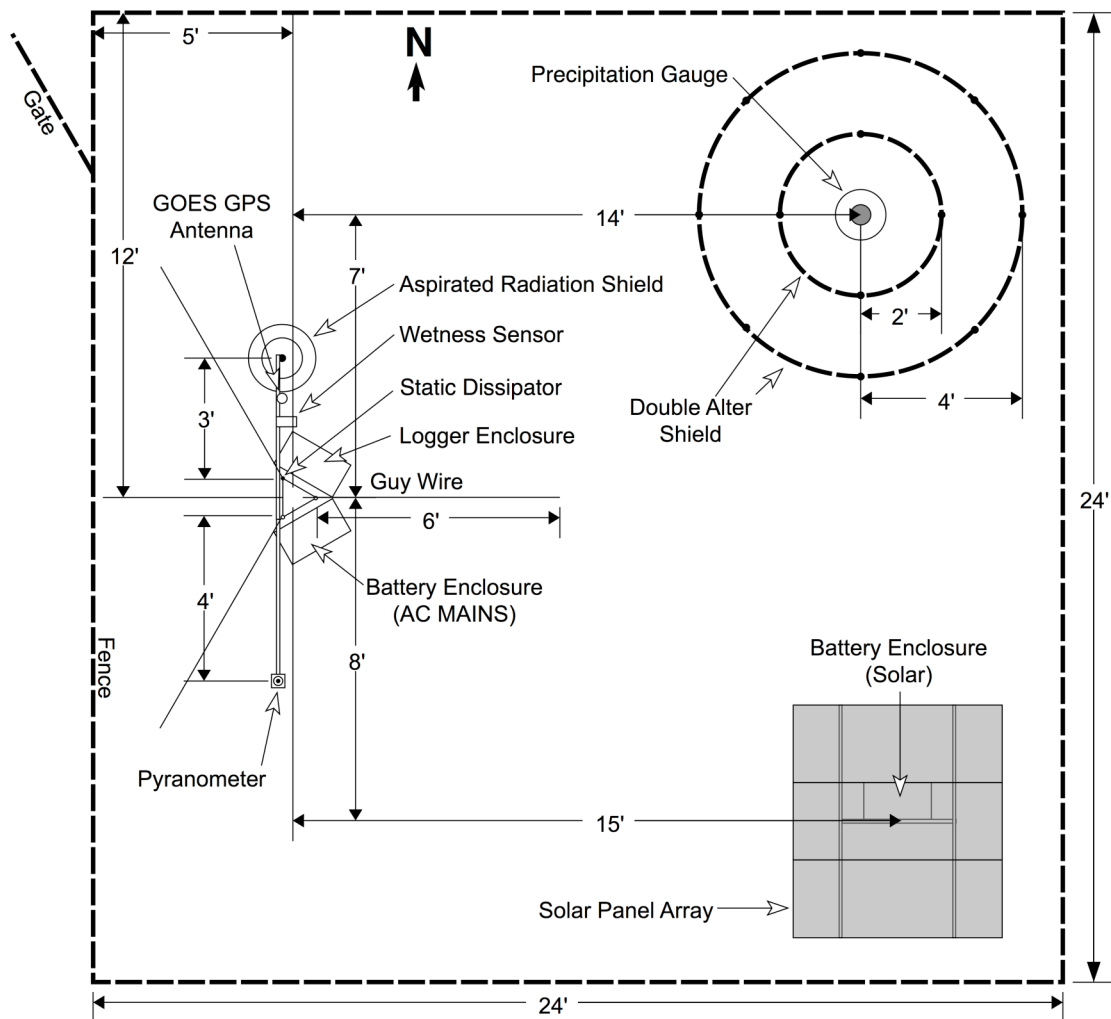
Plan view of a station plot that measures 24-by-24 feet and has a 3-meter tower.
